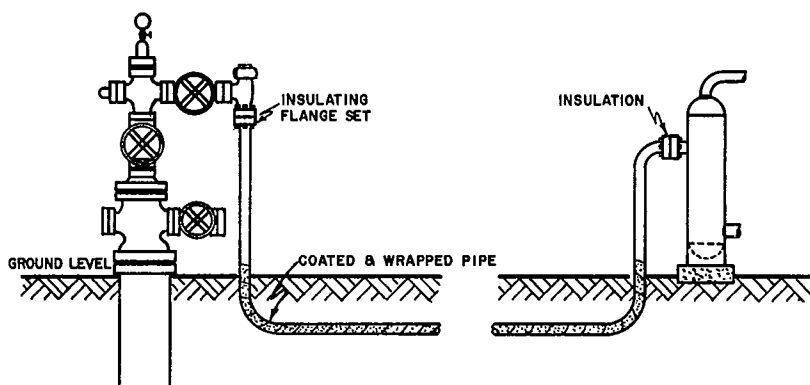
(above) — Insulating Flange to Stop Current Flow between Well Casing and Surface Equipment
